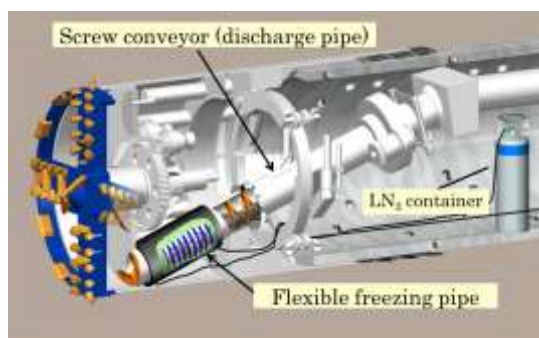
Makeshift water cut-off technique for screw conveyor (discharge pipe) draining pipe of shield machine
